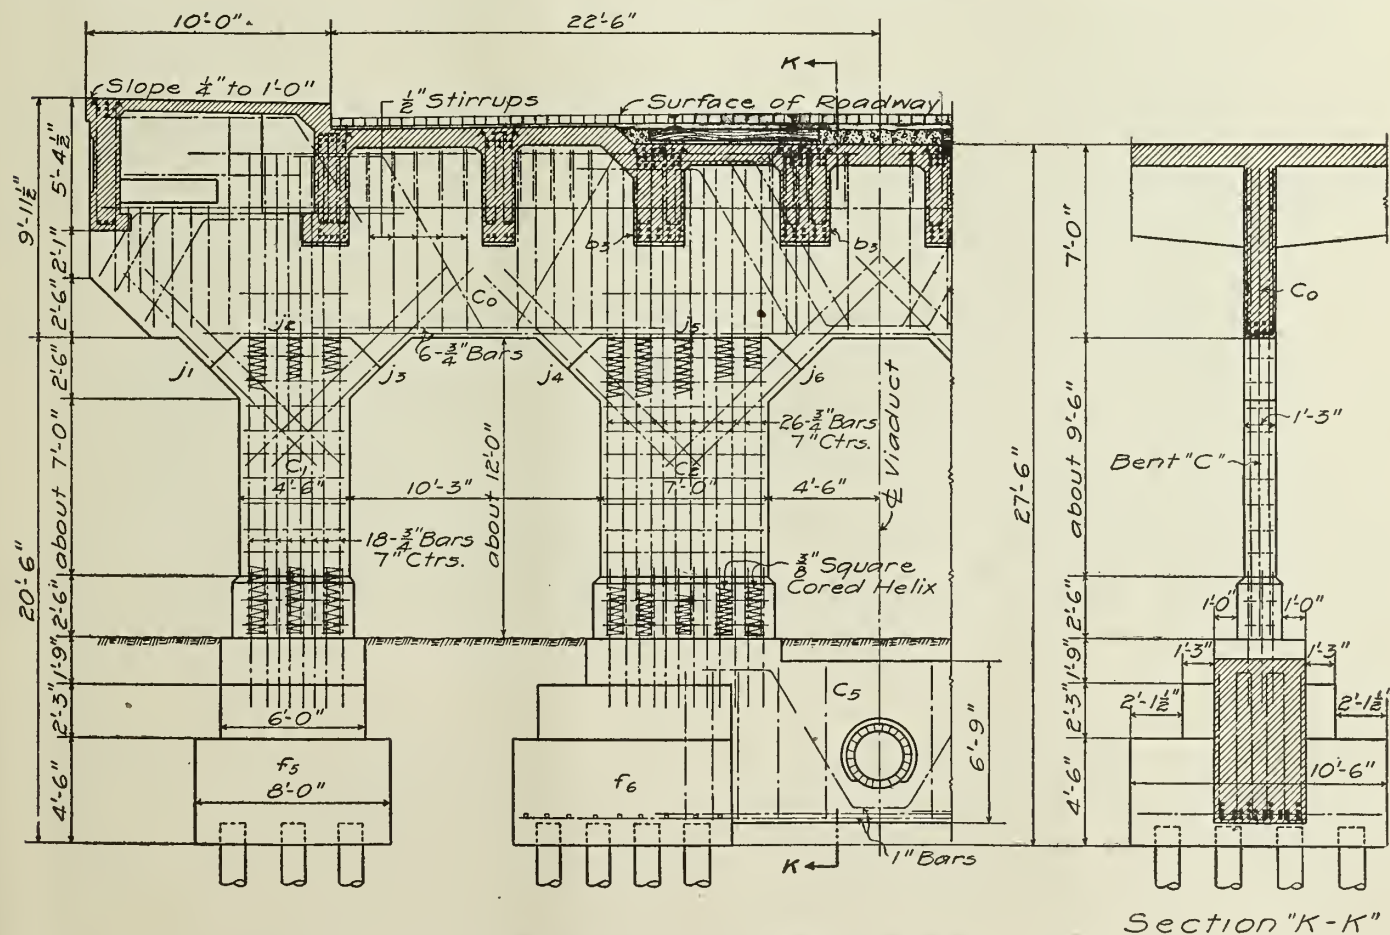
Typical Section Showing Reinforcement in Bents, Desplaines St. Viaduct.
